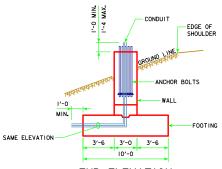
### DETAIL R LOCATION OF CONDUIT WITHIN ANCHOR BOLT CIRCLE
